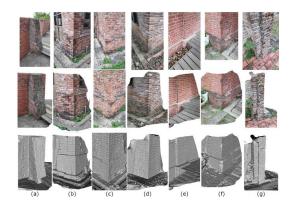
3D photogrammetric modeling of warehouse corner details: (a) wall & buttress; (b) building E-1; (c) building E-2; (d) building B; (e) building D: column & wall; (f) building D; (g) building A, as displayed by field photographs (top row), 3D models (middle row), and plain models (bottom row).
